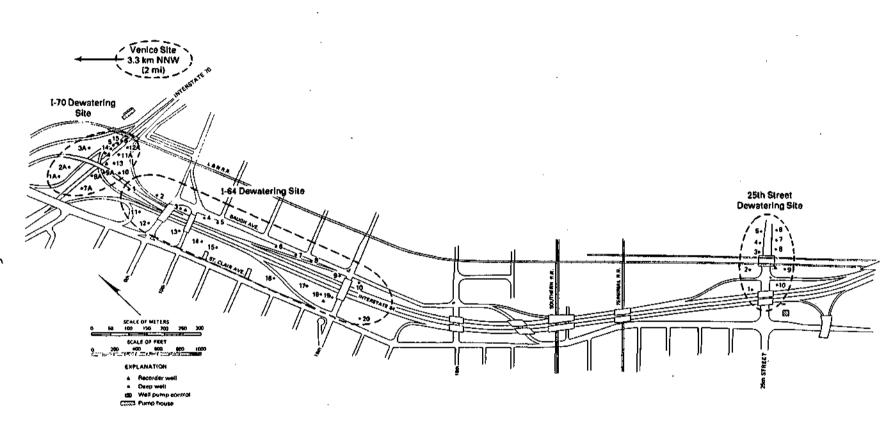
Locations of dewatering wells at the I-70 Tri-level Bridge, I-64, and 25th Street
